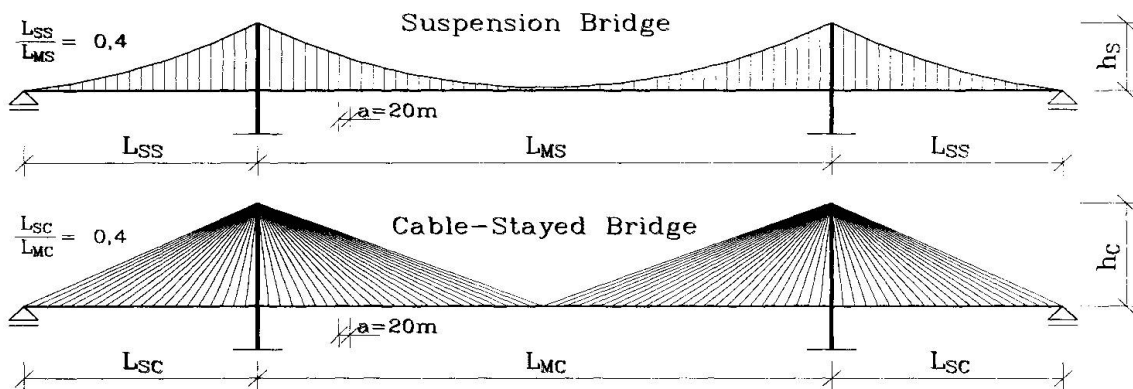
Suspension and cable-stayed bridge systems with fan-shaped cables
